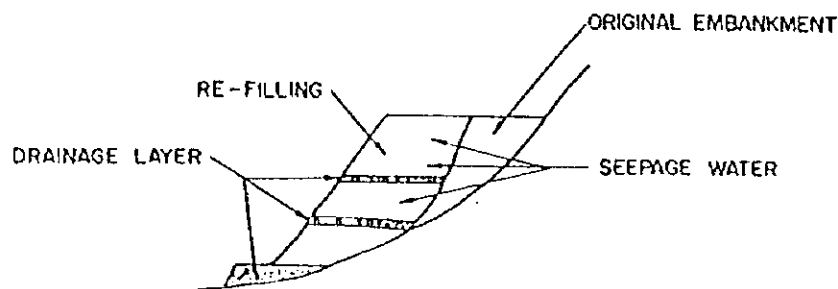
Berm Drainage Layer for Refilling a Fill Slope
